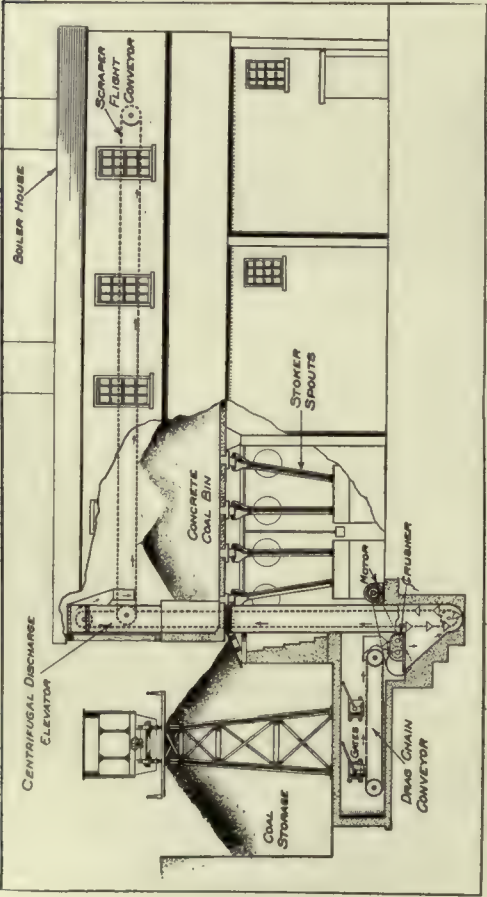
This Layout Permits of Ground Storage Under the Trestle
